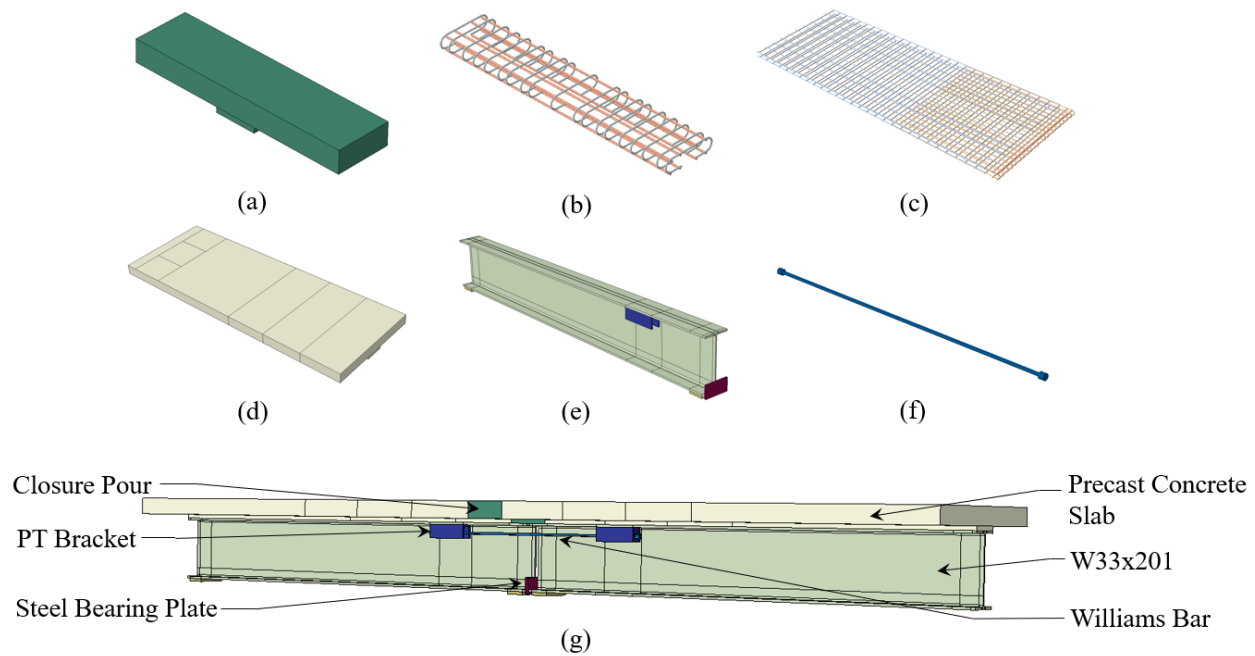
(a) Concrete Closure Pour, (b) Rebar in Closure Pour, (c) Rebar in Precast Concrete Slab, (d) Precast Concrete Slab, (e) Steel Girder with PT Bracket and Steel Bearing Plate, (f) Williams Bar, and (g) Model Assembly.
